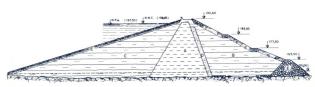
Embankment dam cross section (A – clay core; B;C – downstream and upstream shoulders; D – chimney filter; E – rockfill).
